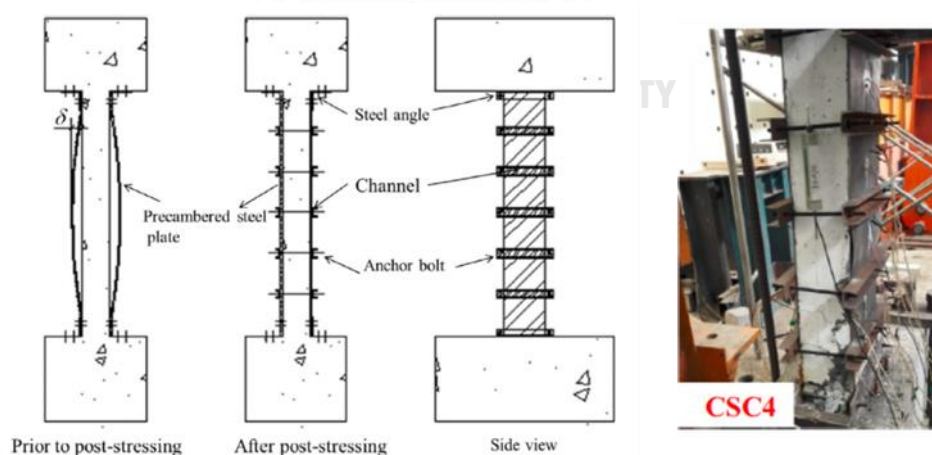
Layout of strengthened columns (Wang and Su, 2012)
